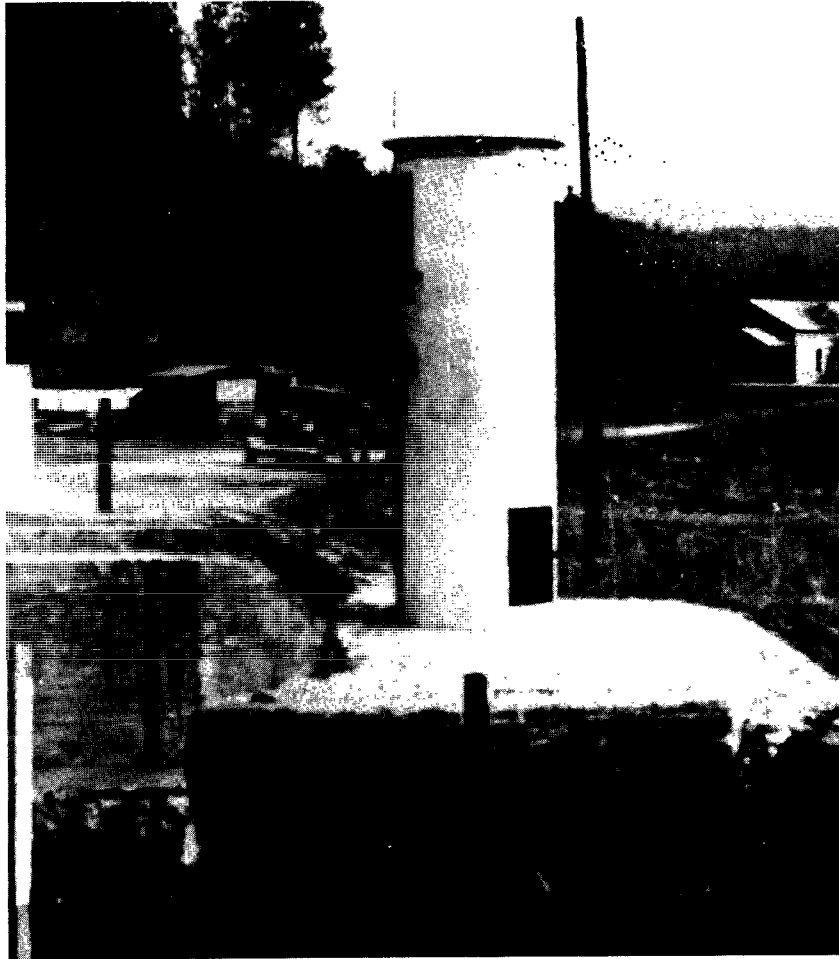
Concrete-pipe well and shelter. (Note clean-out door, staff gage, and upper intake pipe.)
